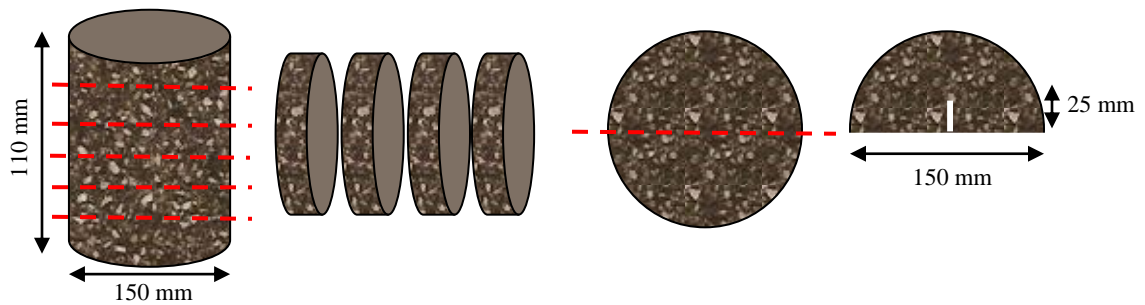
Illustration of SCB specimen coring and cutting procedure.
